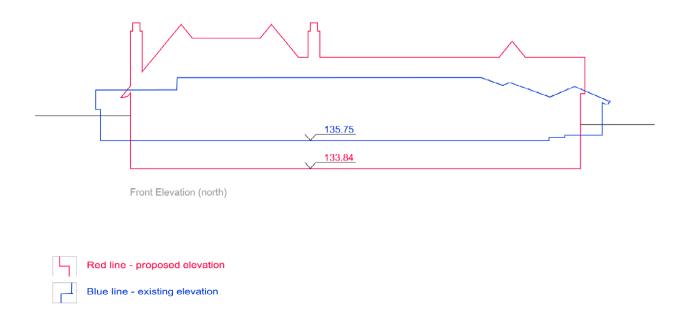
Extract from drawing 16182 (PL) 009 Elevations Overlay
